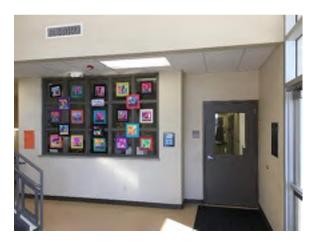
CMU partitions are typical wall construction for 2012 addition.
